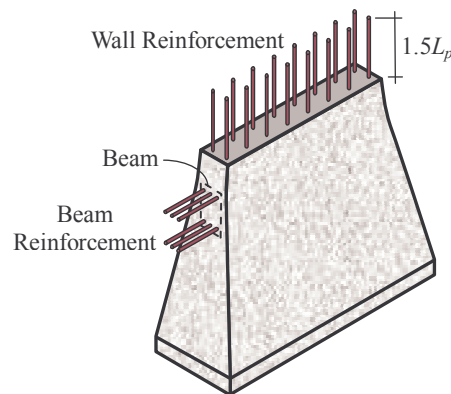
Precast tapered portion in RC wall-footing without enlarged boundary elements.
